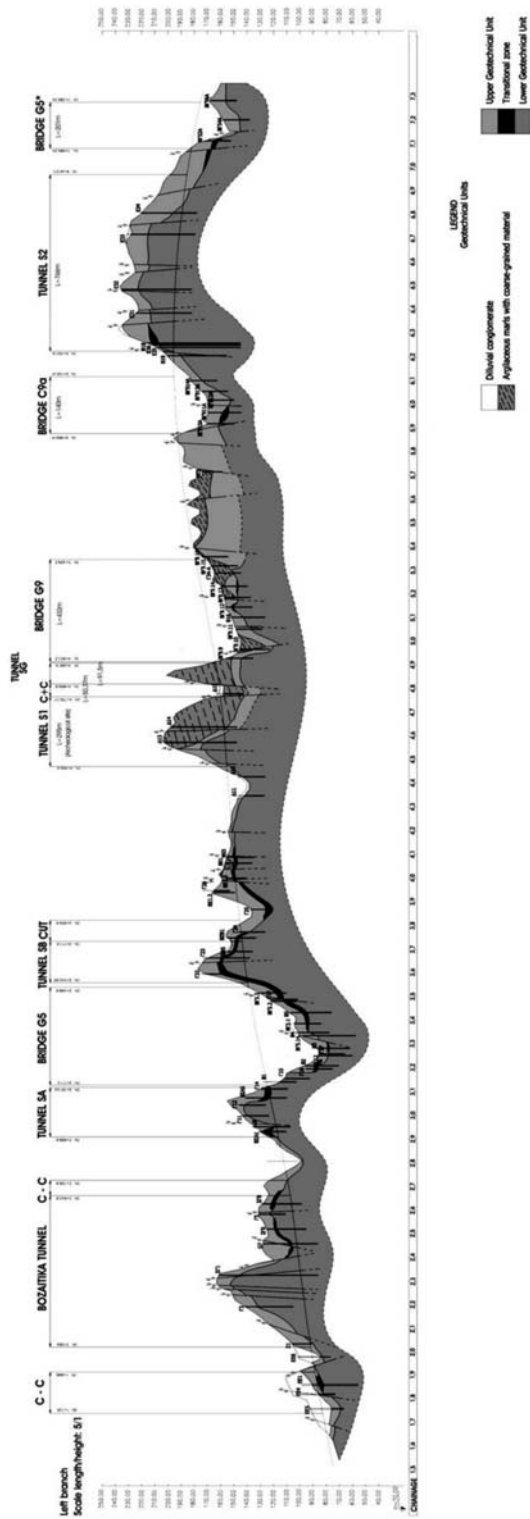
Geotechnical cross section of the left branch of Patras Ring Road with the various underground works (Ch. 1+500 to Ch. 7+300).
